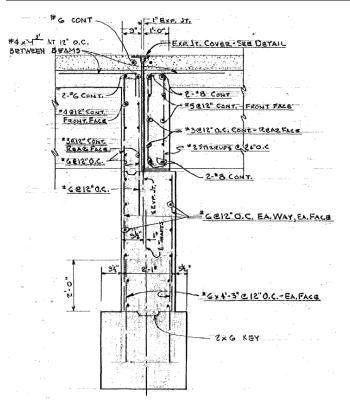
Cross-section through expansion joint at Bents 10 and 17, reproduced from PHA drawings.
